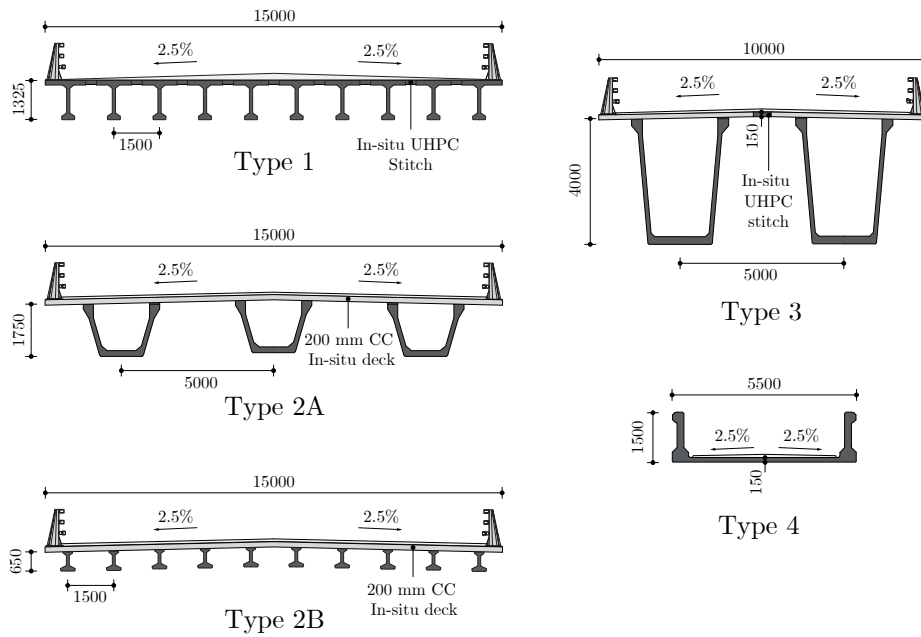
Typical UHPC bridge types used in Malaysia. Adapted from [7].
